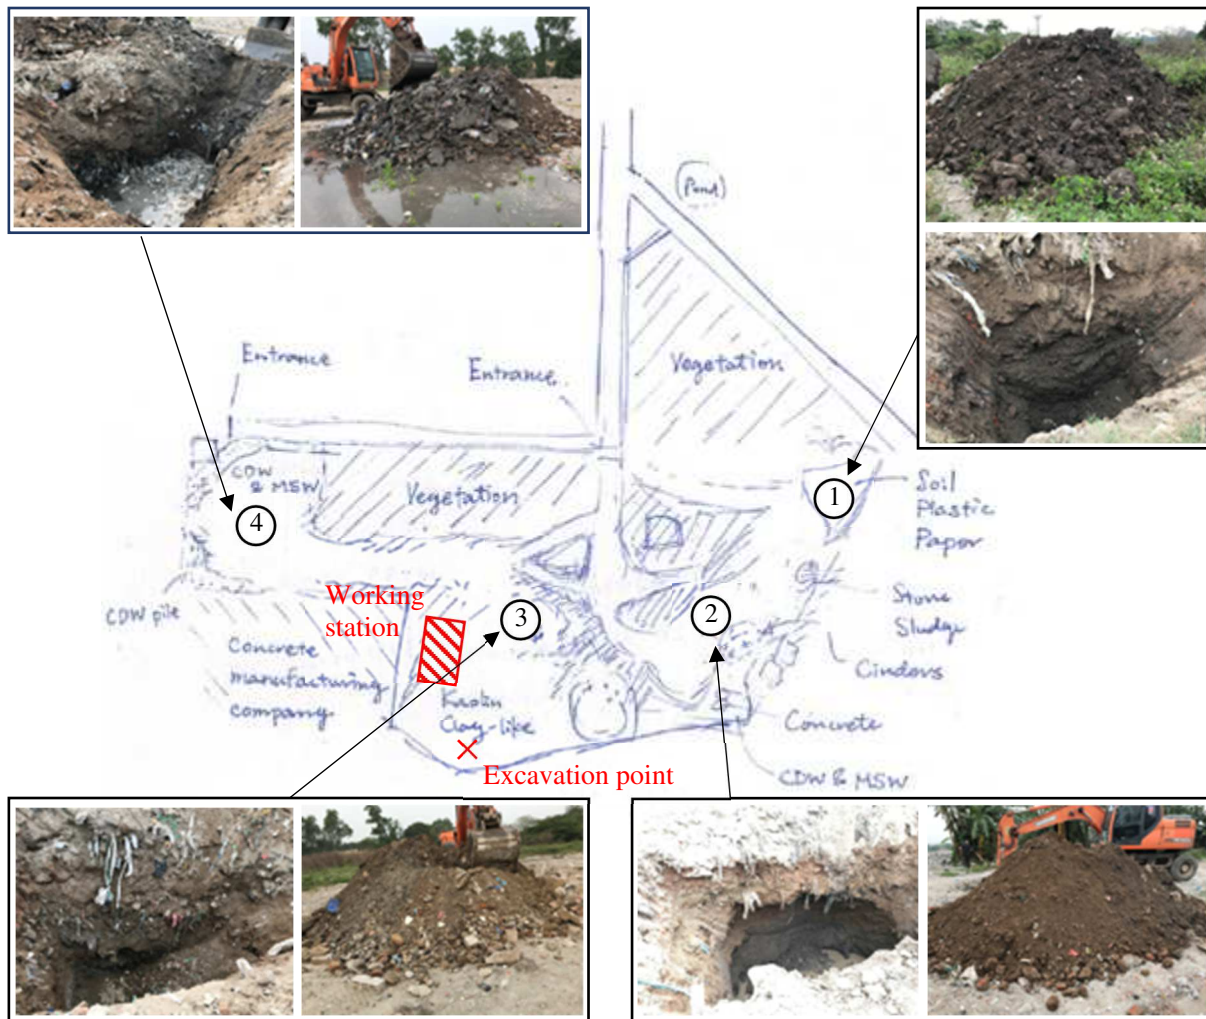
Sketch of Vinh Quynh CDW landfill. To decide the point of excavation at the site, trial excavations were carried out at 4 points (①~④).
